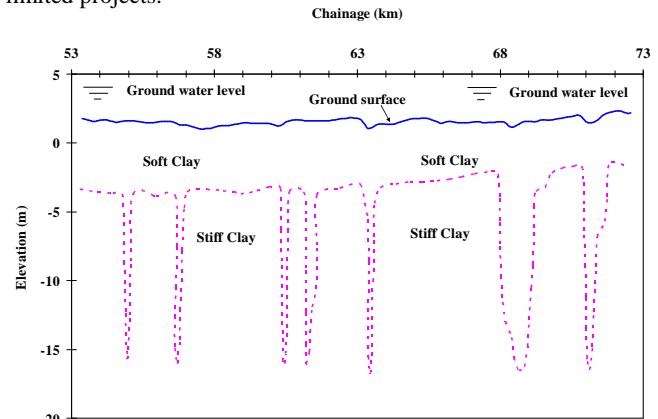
Longitudinal section of the Nakon Sawan Highway (Eide, 1977)
